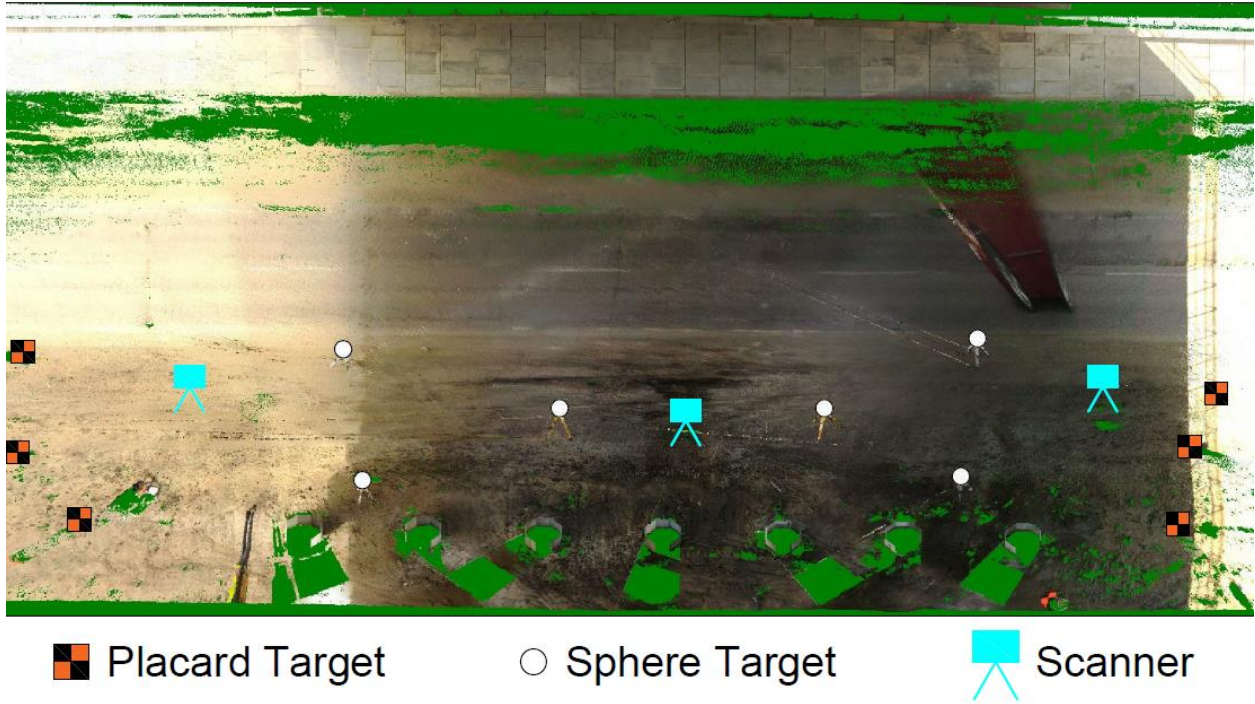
Scan and Target Layout used for North Abutment 190813
